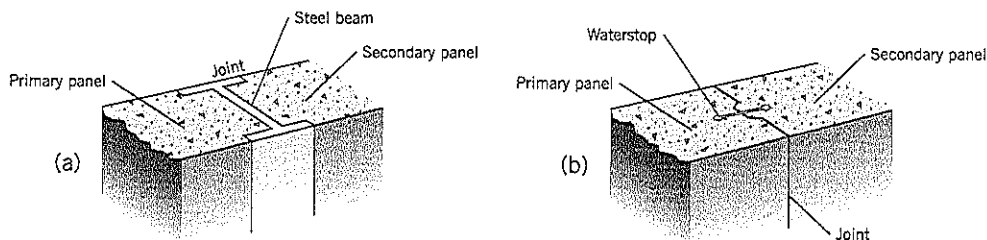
Alternative vertical joints for a slurry trench diaphragm wall: (a) steel H-beam (b) keyed joint with waterstop (after Tamaro and Poletto, 1992)
